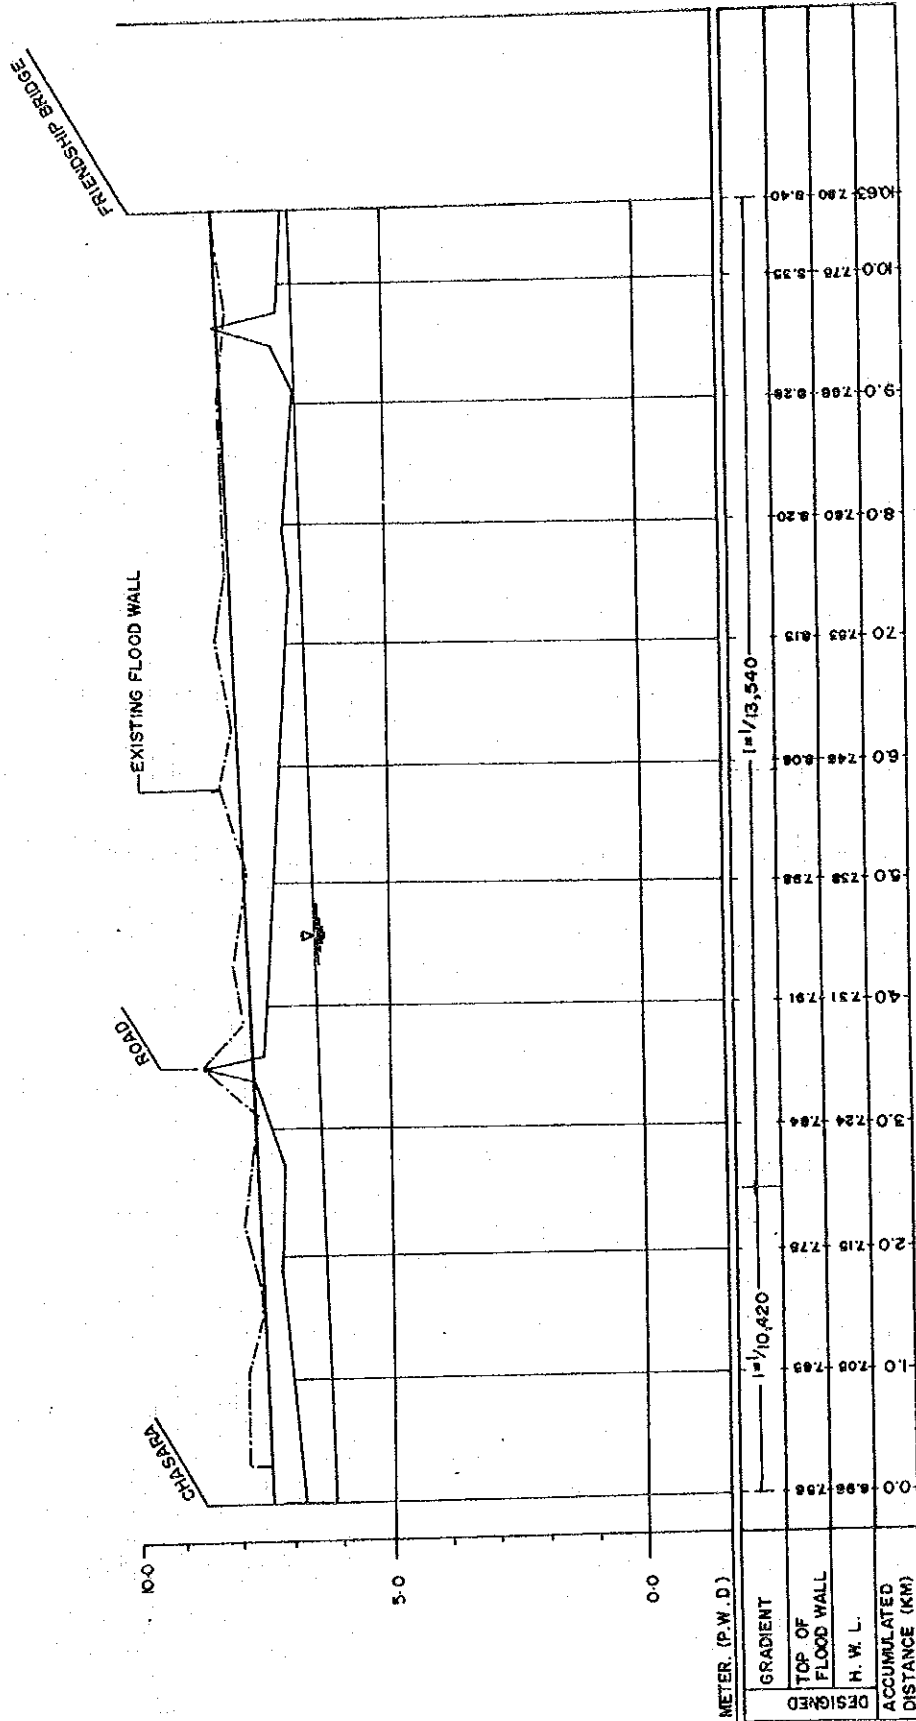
(1) LONGITUDINAL SECTION OF FLOOD WALL : DND (DW)
